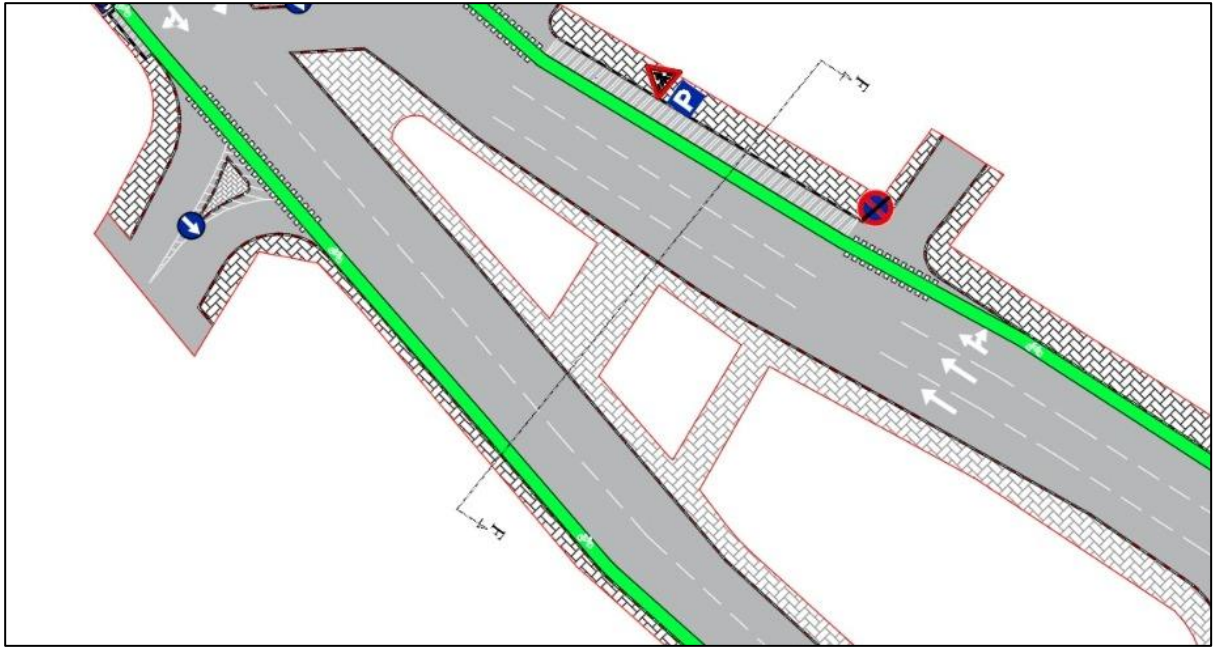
16: Plan Drawing, Section F-F, Al-Malek Faisal Street
